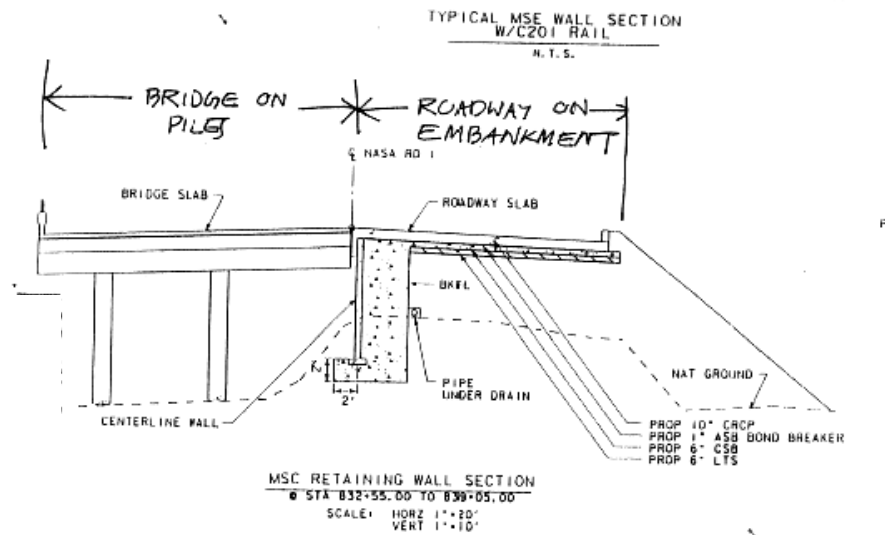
Cross Section of the NASA Road 1 Embankment (Project 4).
